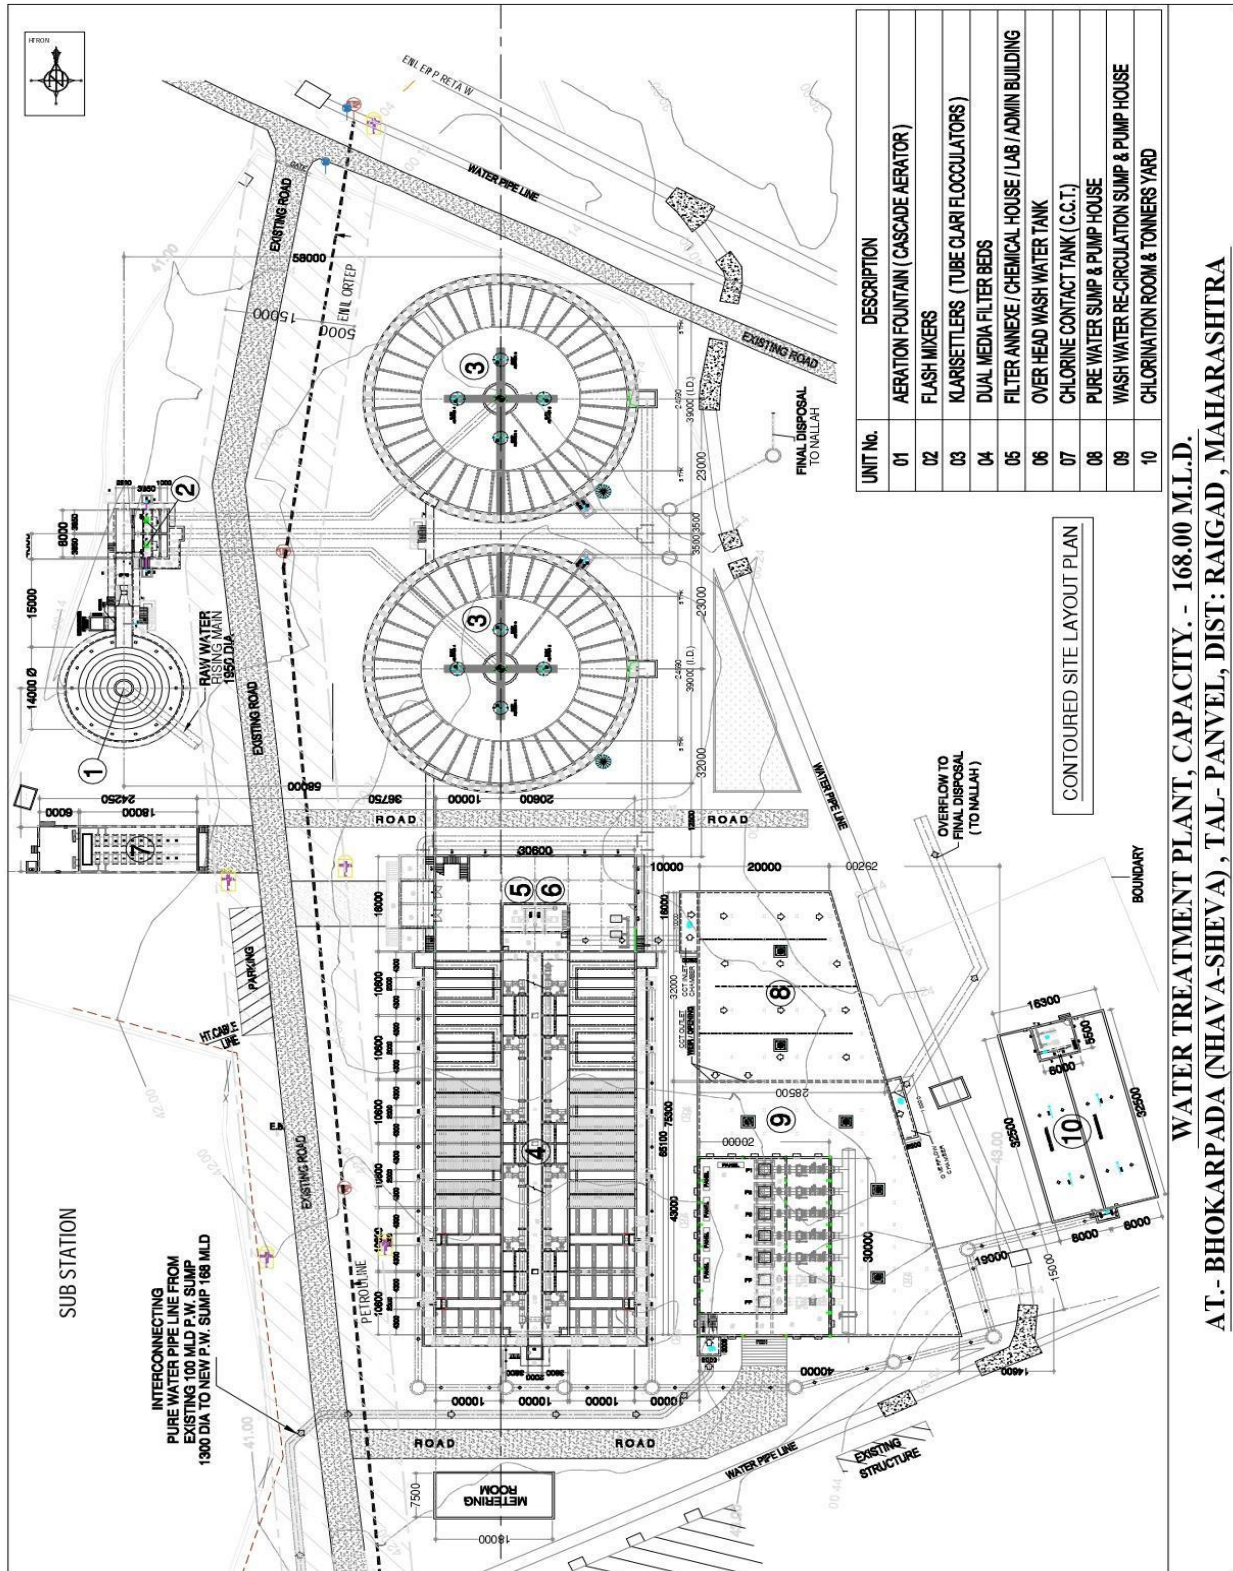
Layout of WTP Capacity 168 MLD at Nhava-Sheva, Dist. Raigad, Maharashtra
